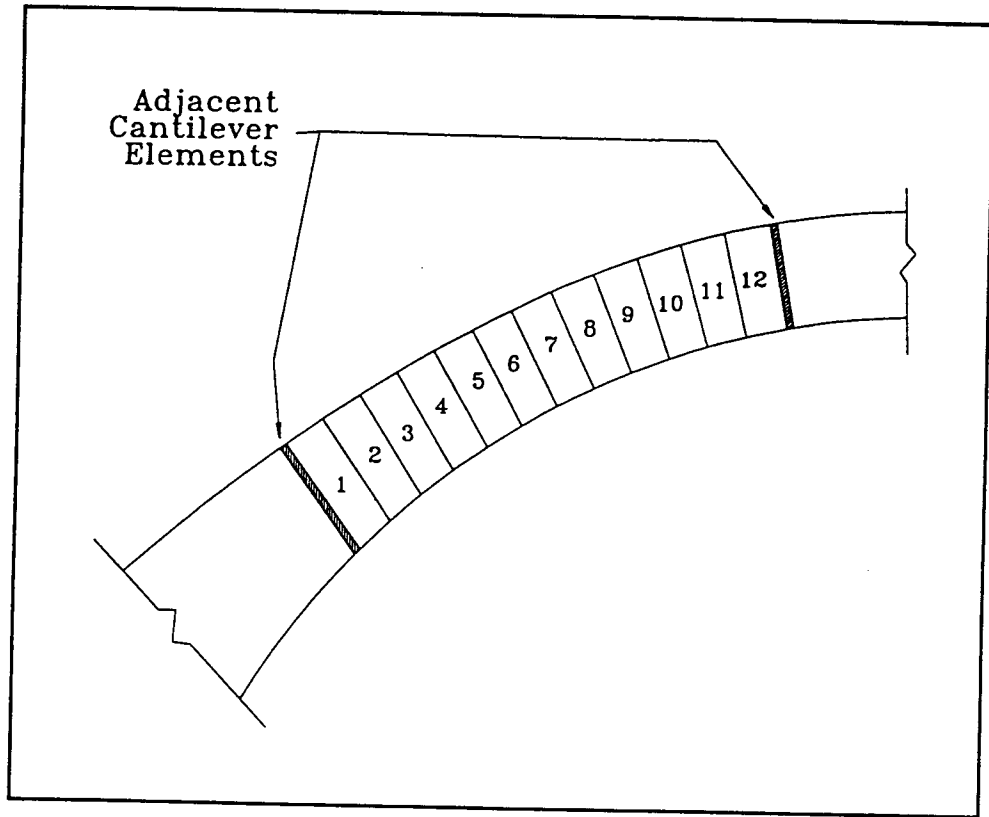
Typical arch section showing 12 voussoirs between adjacent cantilever elements
